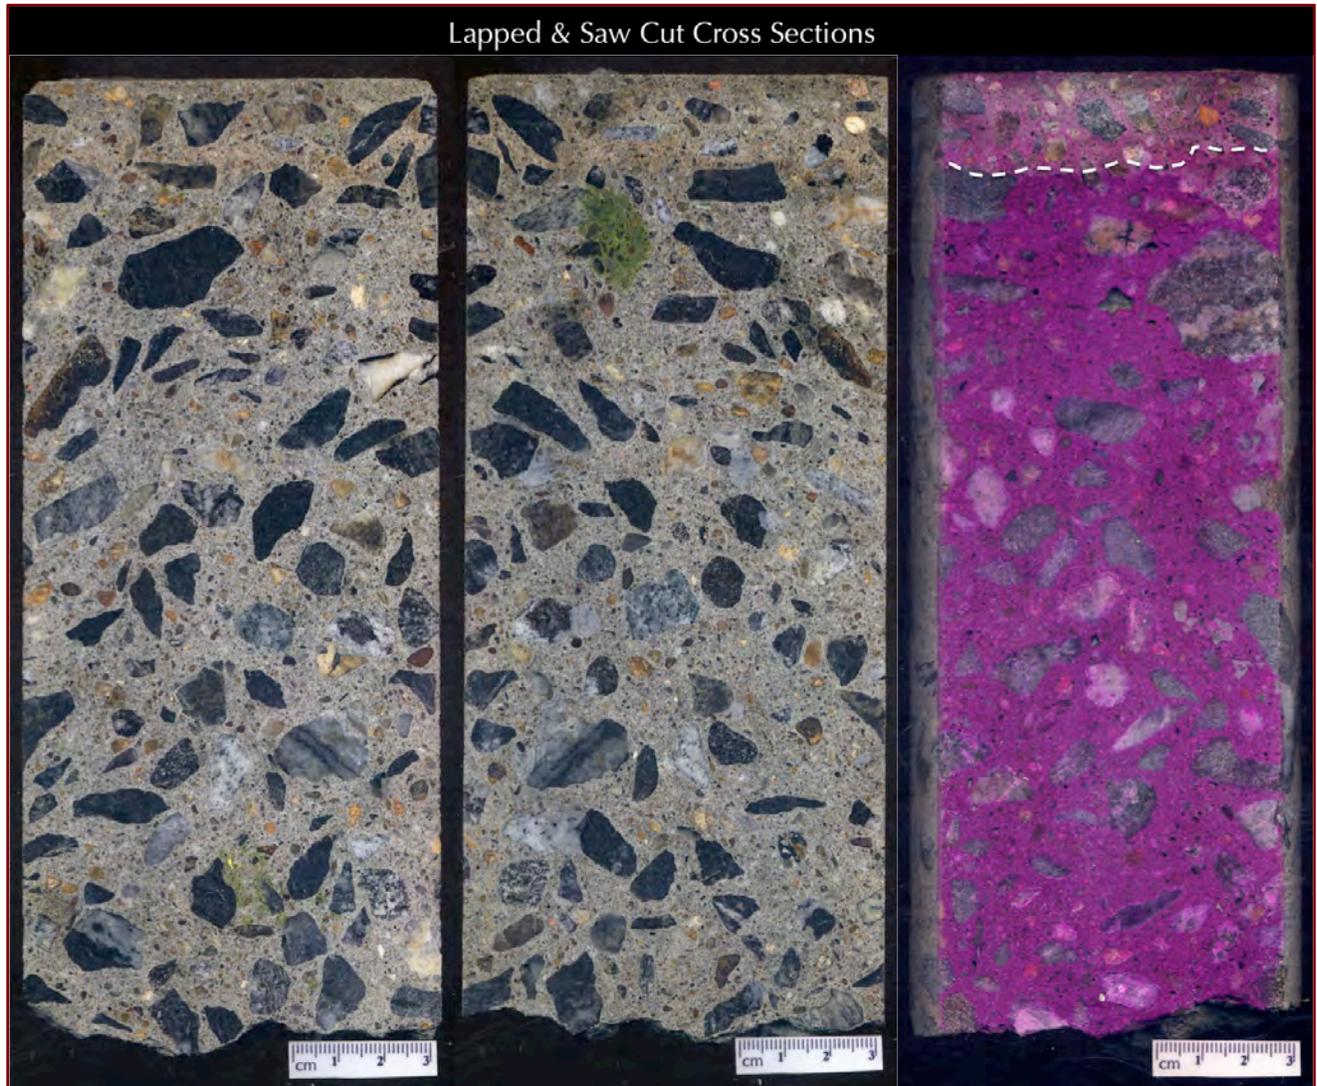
Lapped cross sections of the core showing: (a) no cracking in concrete as opposed extensive cracking found in many other foundation walls from eastern Connecticut that are affected by pyrrhotite-related distress in concrete; and (b) a saw-cut cross section at right after treatment with a phenolphthalein alcoholic solution to highlight non-carbonated concrete that has turned pink after treatment and carbonated concrete at the exposed surface region that remained gray or light pink to a depth of 20 to 30 mm from the exposed surface due to atmospheric carbonation of concrete. Notice good grading and well-distribution of the crushed stone coarse aggregate particles in all cross sections.
